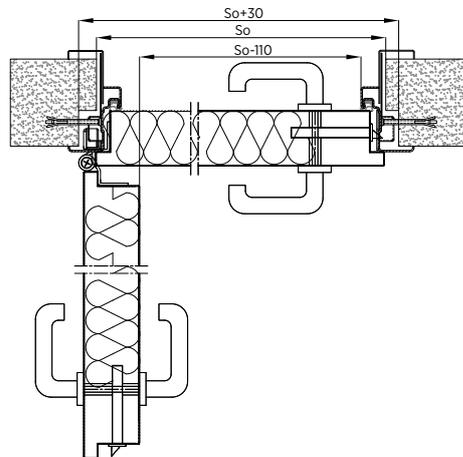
Installation of the ECO Tech single-leaf seamless door with a wrap-around frame without a thermal break to a masonry wall - horizontal cross-section
